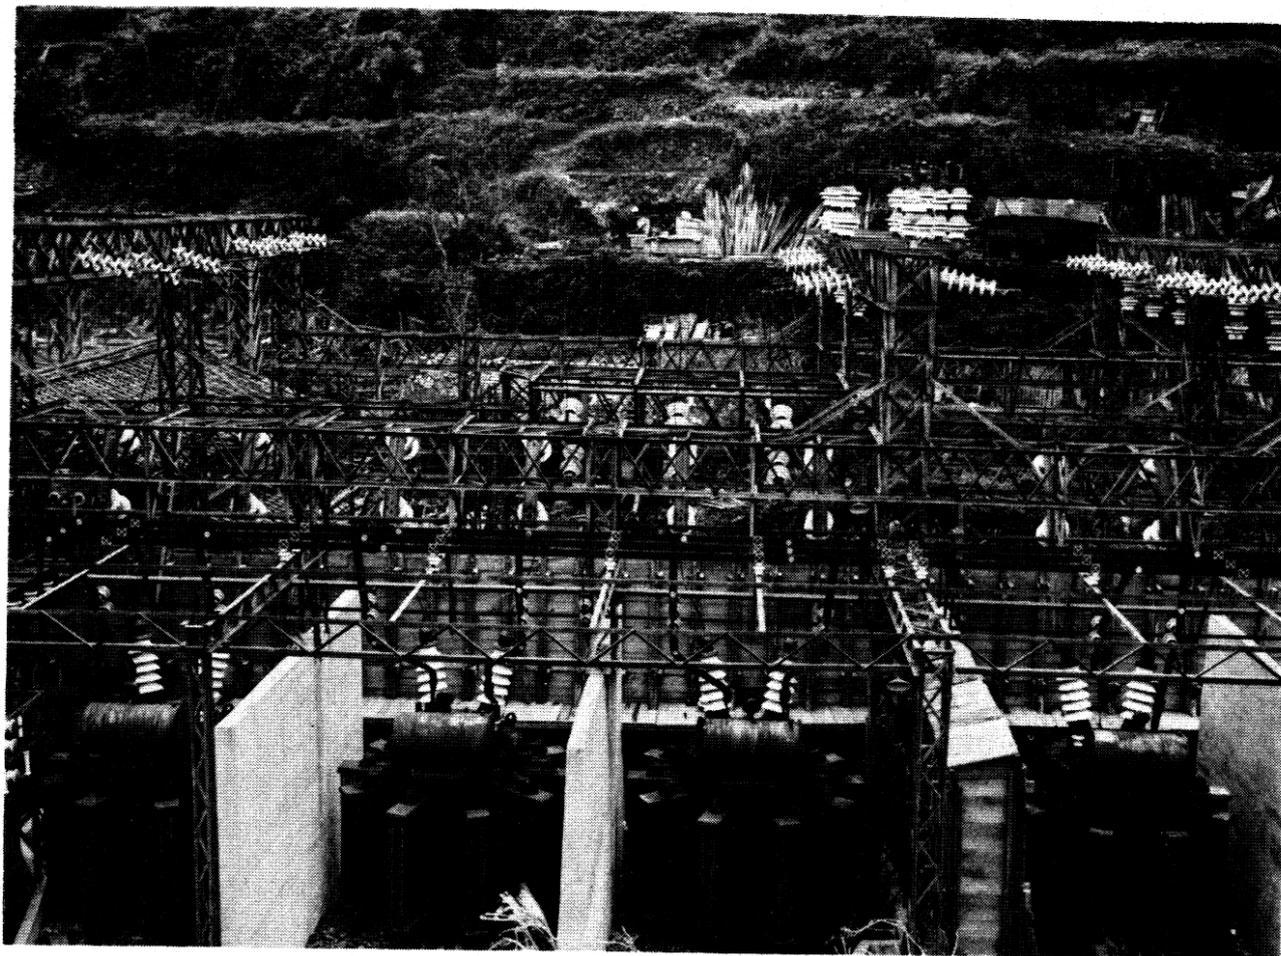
Reinforced-concrete blast walls protecting transformers (1 mile from ground zero at Nagasaki).
